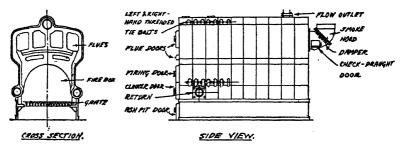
(b).—Cast-iron Sectional Boiler ('Robin Hood').
